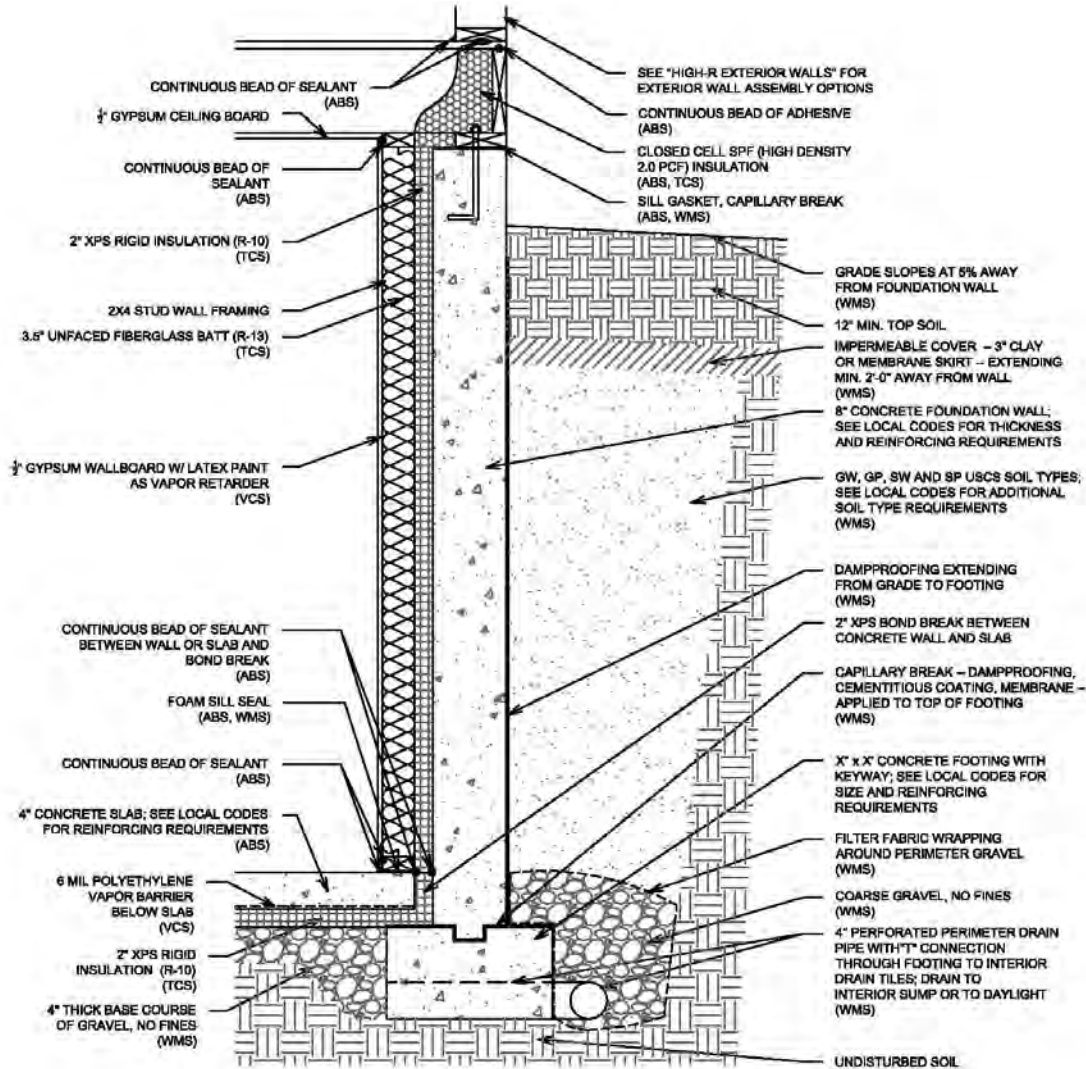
Case 8 Detailed Drawing – Recommended Foundation Wall System
